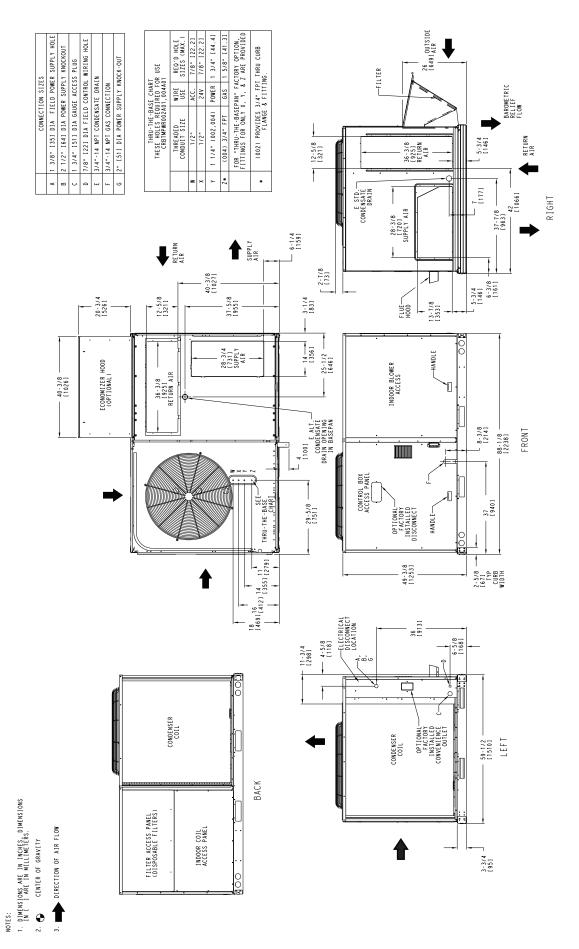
Unit Dimensional Drawing — Sizes 110 and 120
